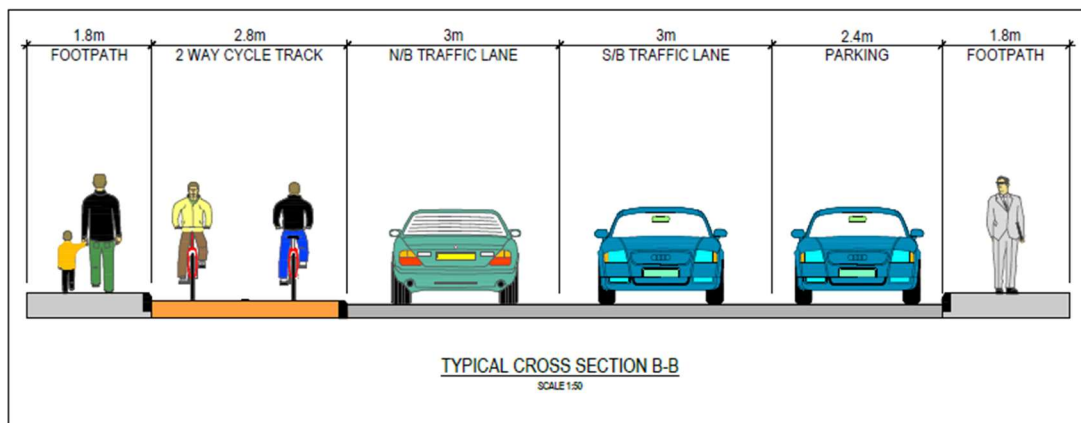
Cross Section for Proposals on Deansgrange Road outside Local Shops Area
